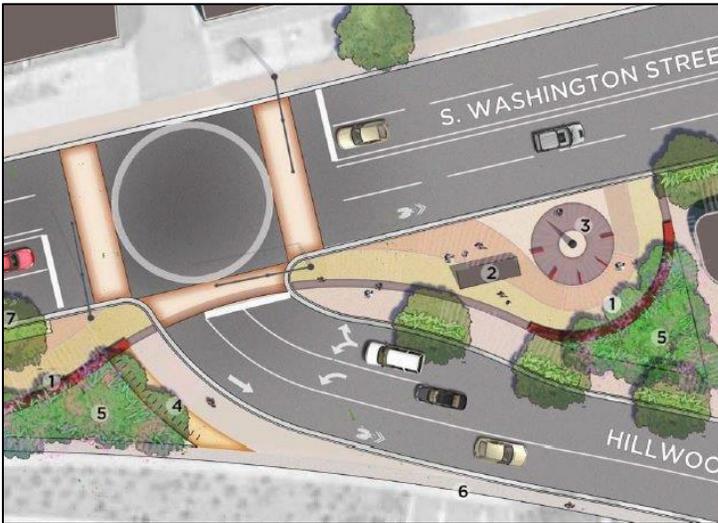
Intermodal Plaza at the intersection of S Washington St & Hillwood Ave
